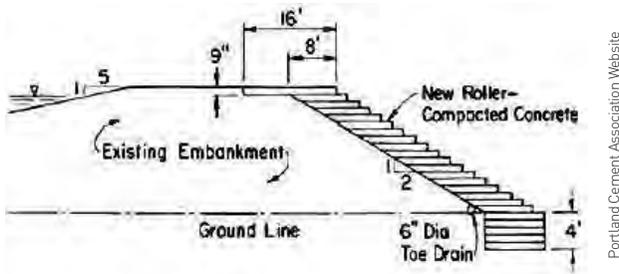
Example of Roller Compacted Concrete Stair Stepped Construction
